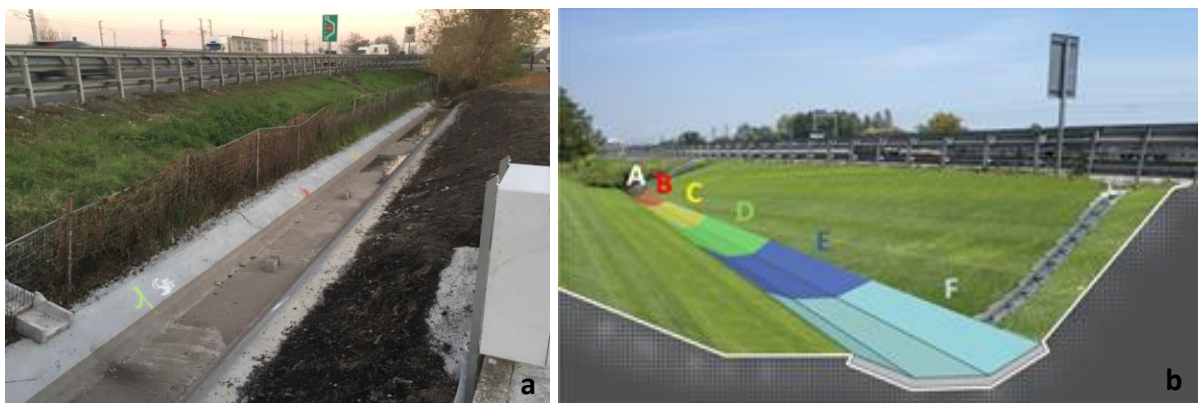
Culvert prototype (a) and schematic division in segments (courtesy of Pavimental) (b).
